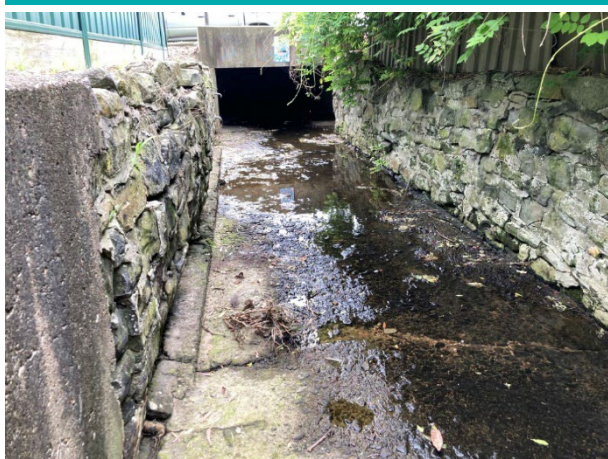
Concrete repairs at termination of stormwater drain at Glebe Road
